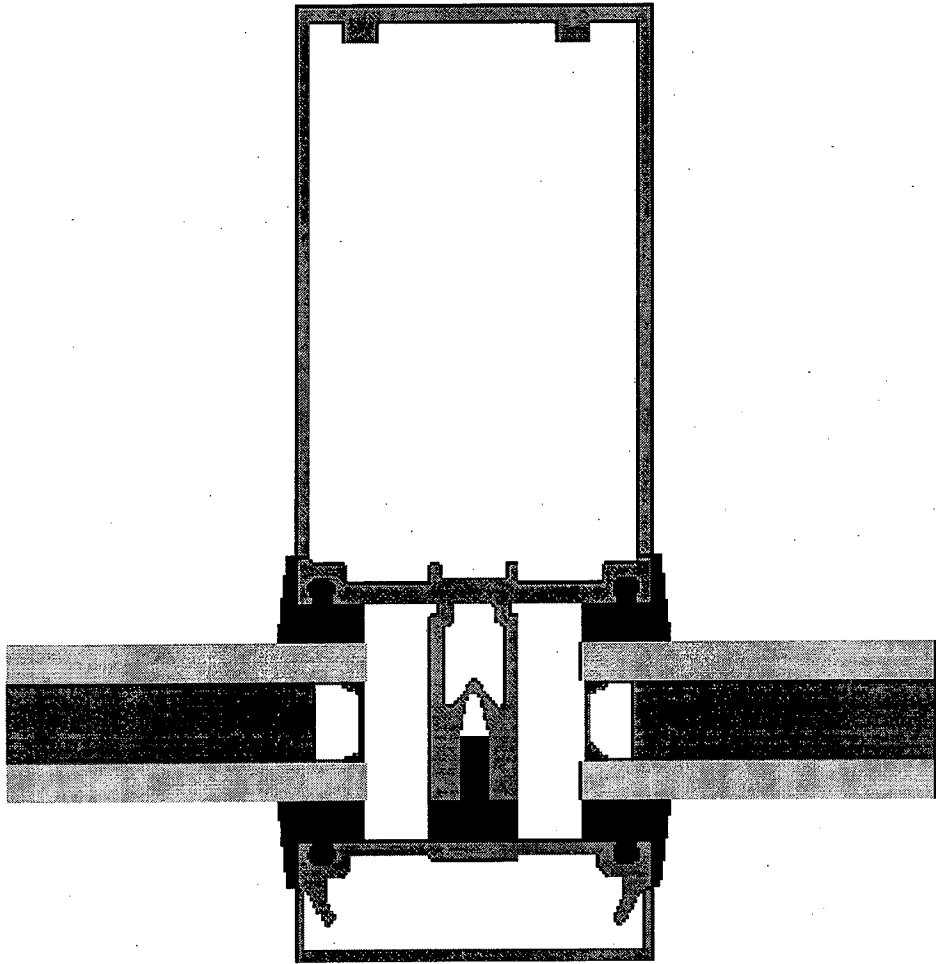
Frame cross section without fastener, shown with Pseudo IG.
